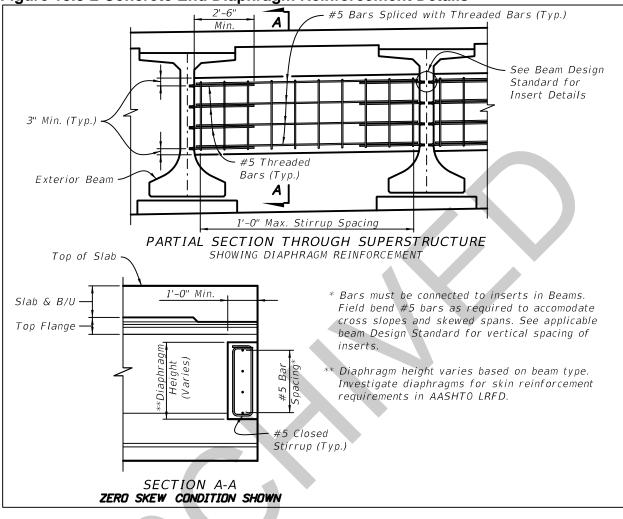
Concrete End Diaphragm Reinforcement Details
